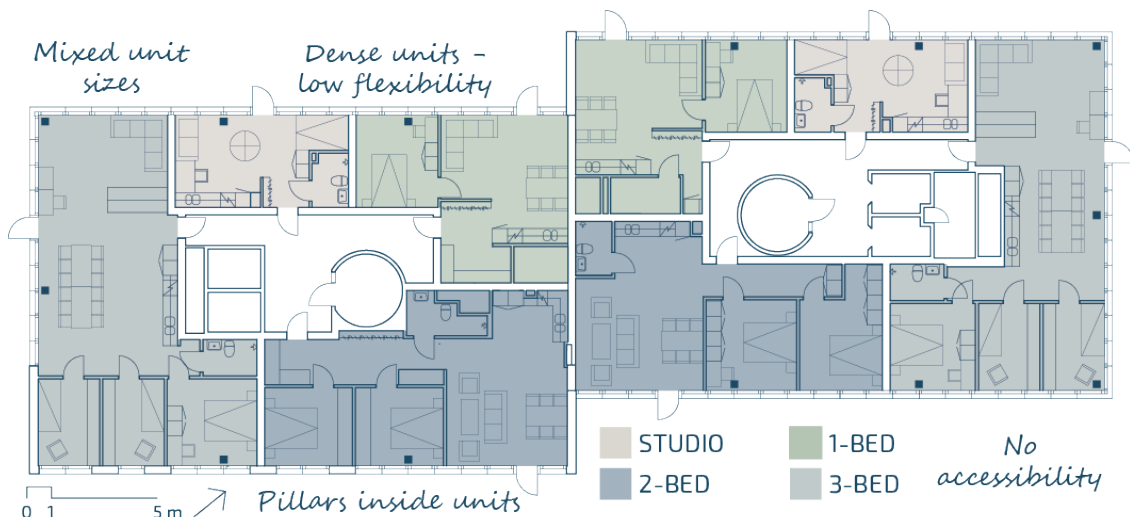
Floor plan for option International standard, adapted from Eriksson (2024)
